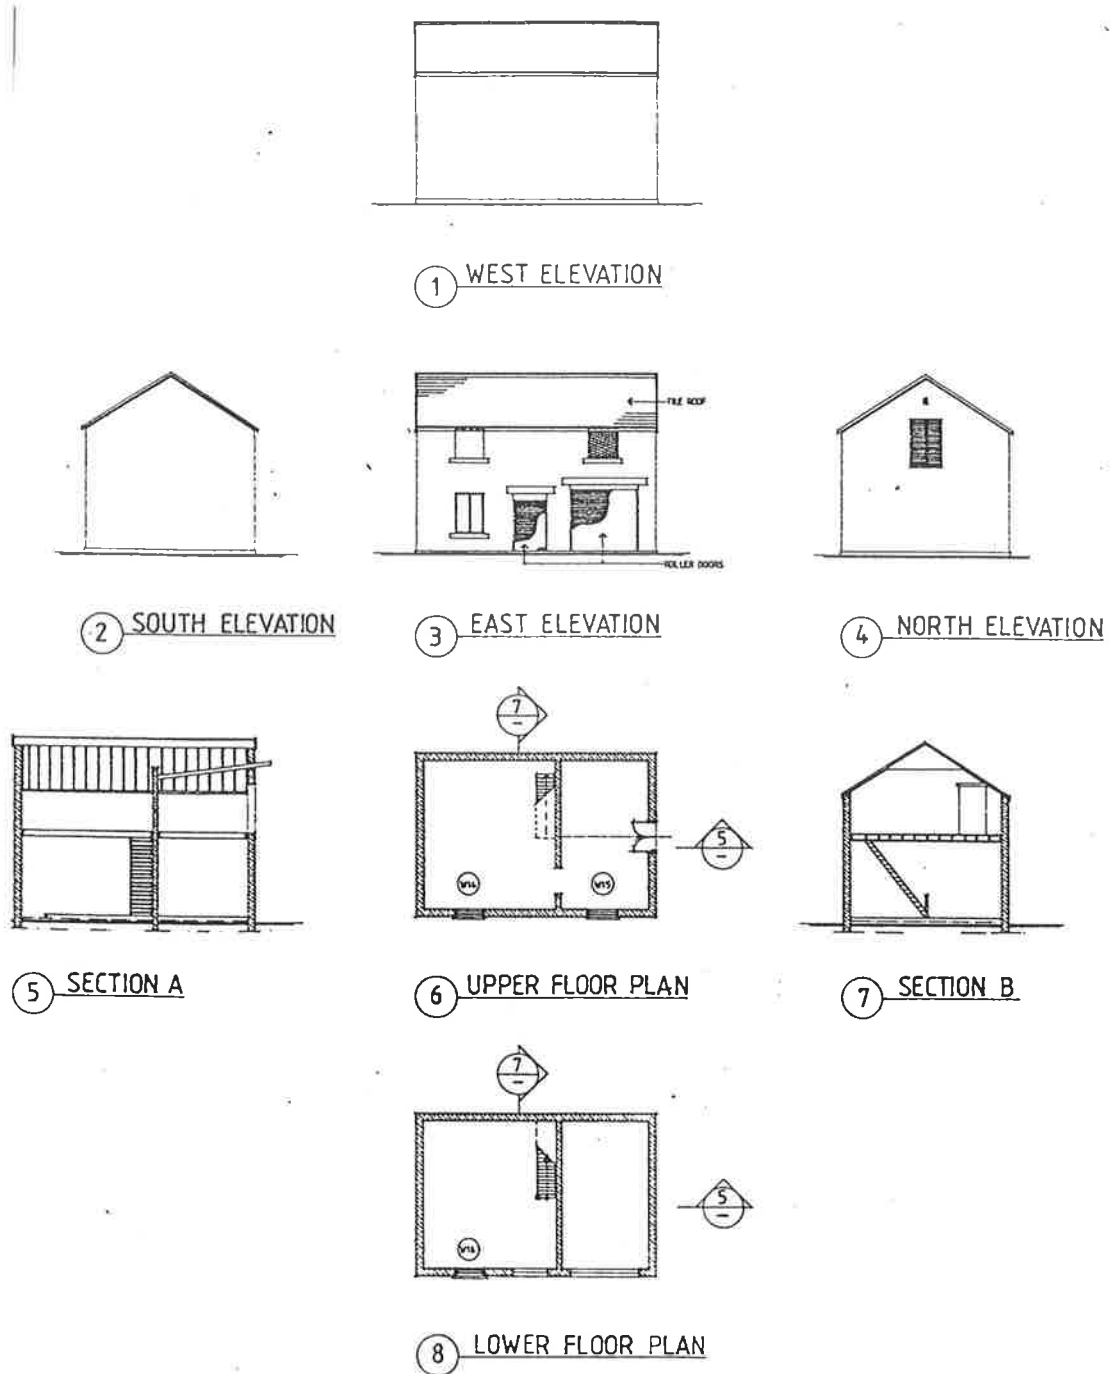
"Perth House" - Stables, 85 George Street, Parramatta – Measured Drawings Plans, Section and Elevations. Prepared by Howard Tanner & Associates, Nov 1988
